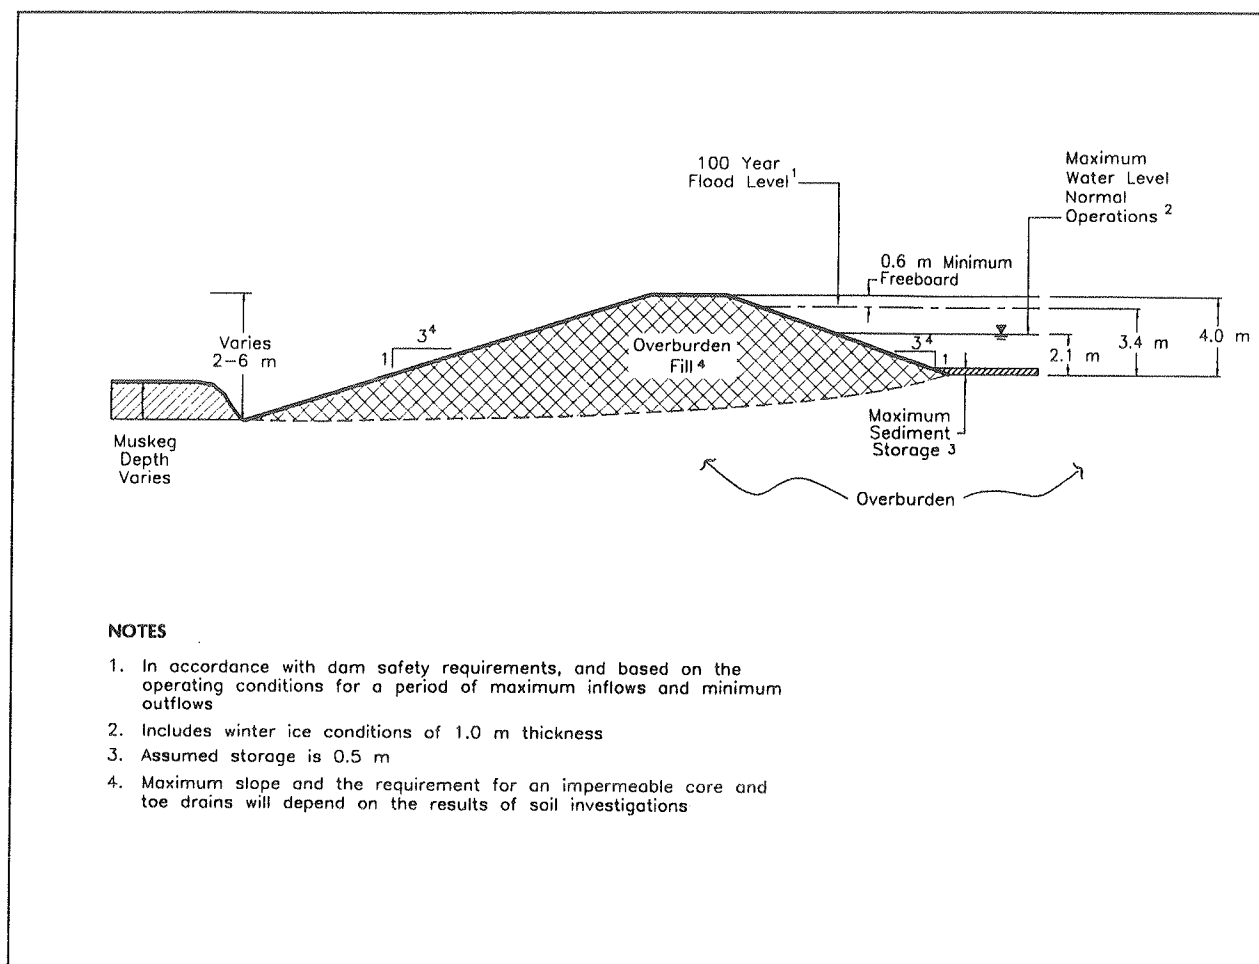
Recycle Pond Containment Dyke Cut and Fill Construction
